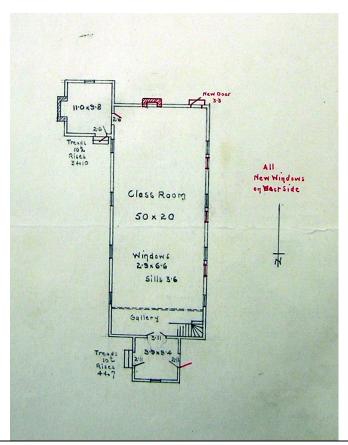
Floor Plan of St. Brigid's Catholic School, n.d. [c.1914] Source: 'St. Brigid's Catholic School, Ballan', public building file, VPRS 7882 Unit 3701, PROV.
